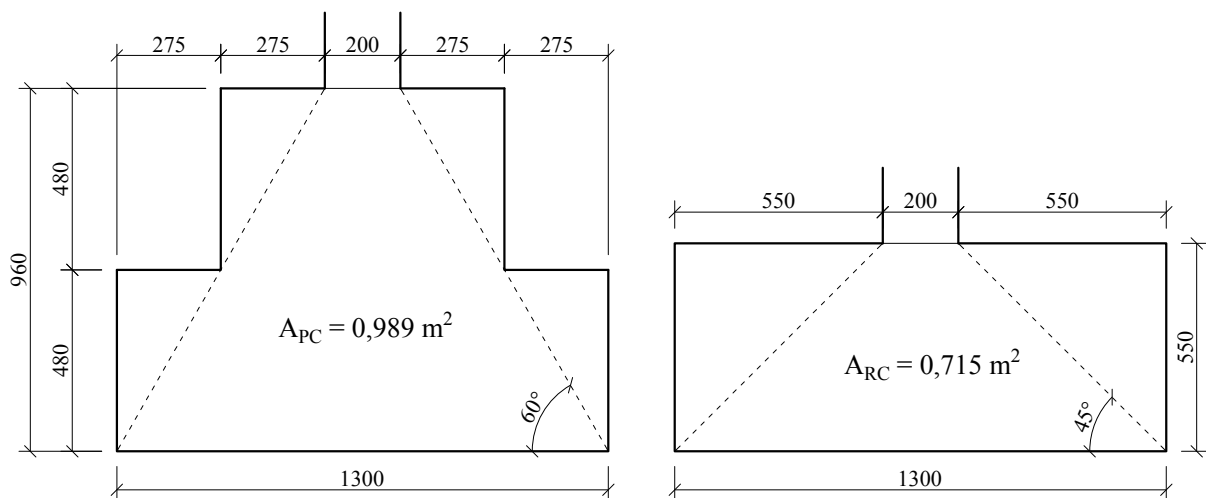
Dimensions of strip foundation alternatives - plain concrete (left) and reinforced concrete.
